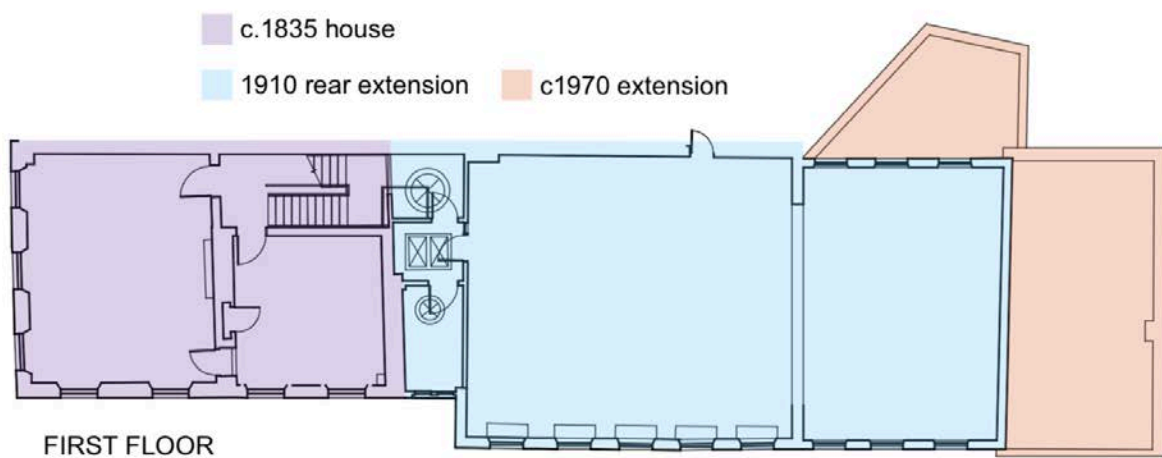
Basic phased first floor plan of De Grey House. Note - c.1970s extensions (orange) in separate ownerships.
